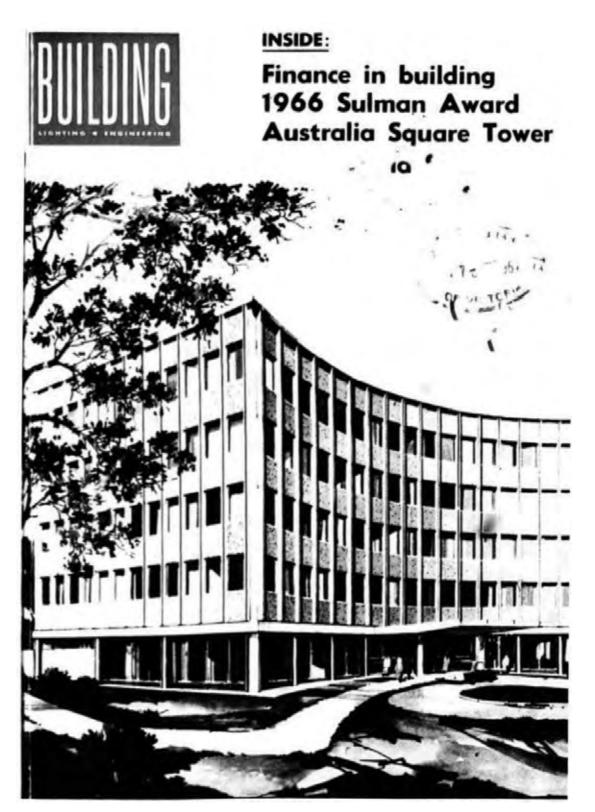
The architects' perspective drawing of the approved and built 3M office. Source: Building, Lighting, Engineering, July 1967, front cover
